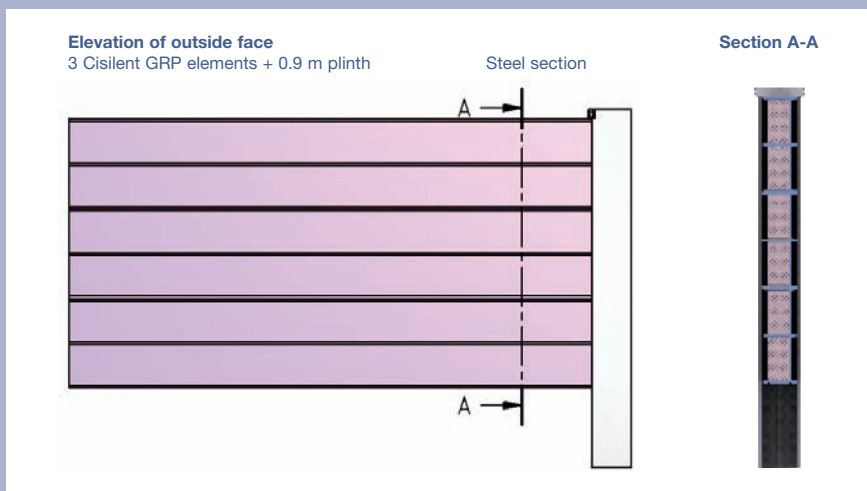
Noise barrier made of Cisilent GRP elements; elevation of wall side furthest away from noise source and cross section
